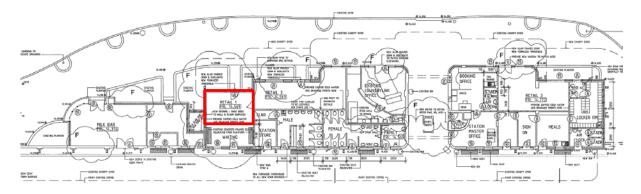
Location plan showing the office (Source: Sydney Trains Plan Room, 1994 alterations and addition, proposed floor plan).
